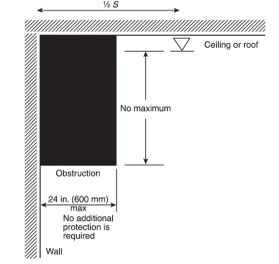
(a) Obstruction Against Wall (SSU/SSP).
